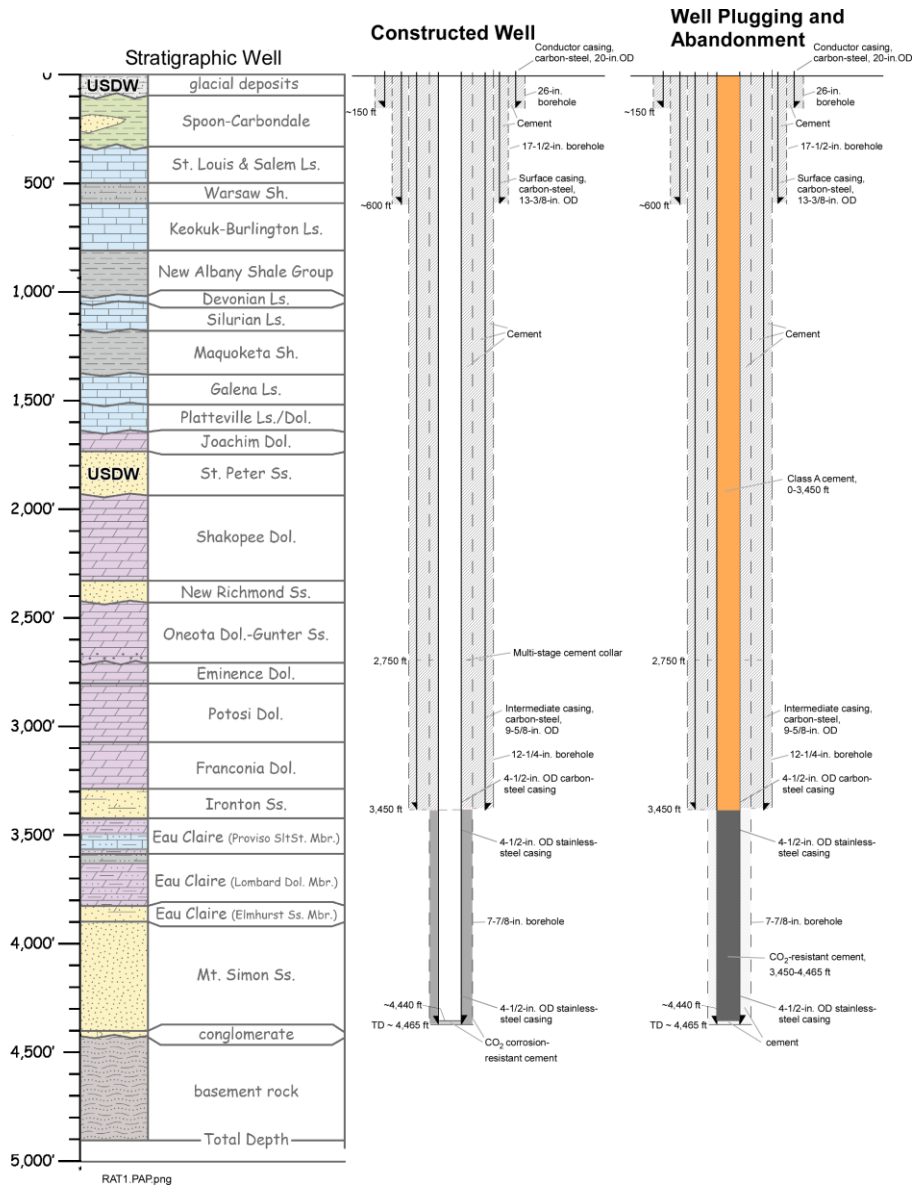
Construction design and plugging and abandonment plan for the reservoir access tube wells.
